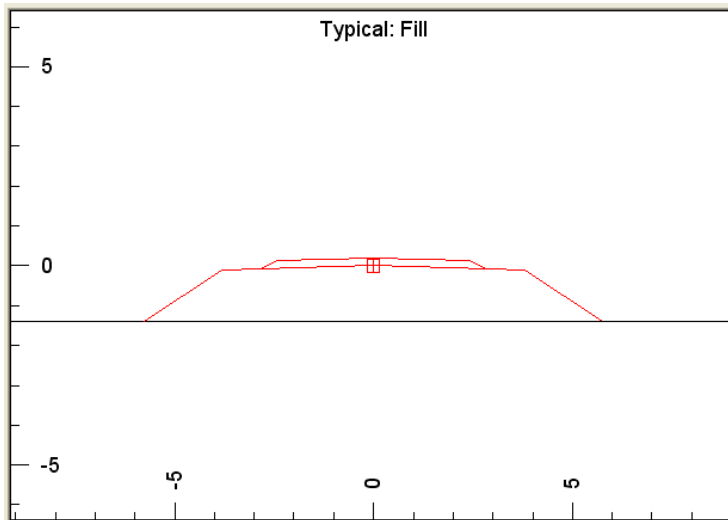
Typical fill widening Traveled width is the standard 4.8 meters.
